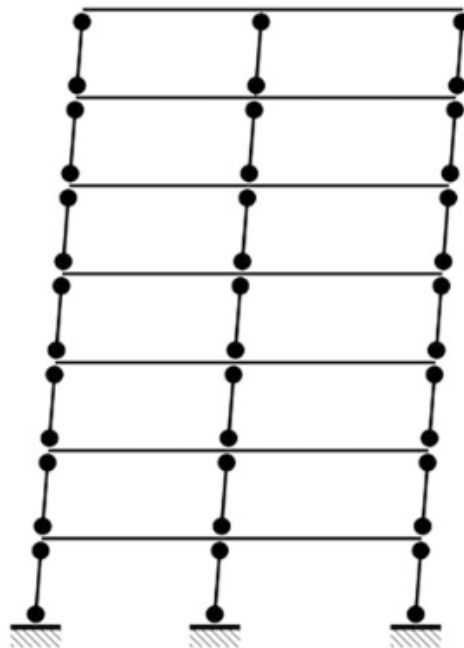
Unfavourable “column-sway mechanism” (Avramidis et al., 2016)
